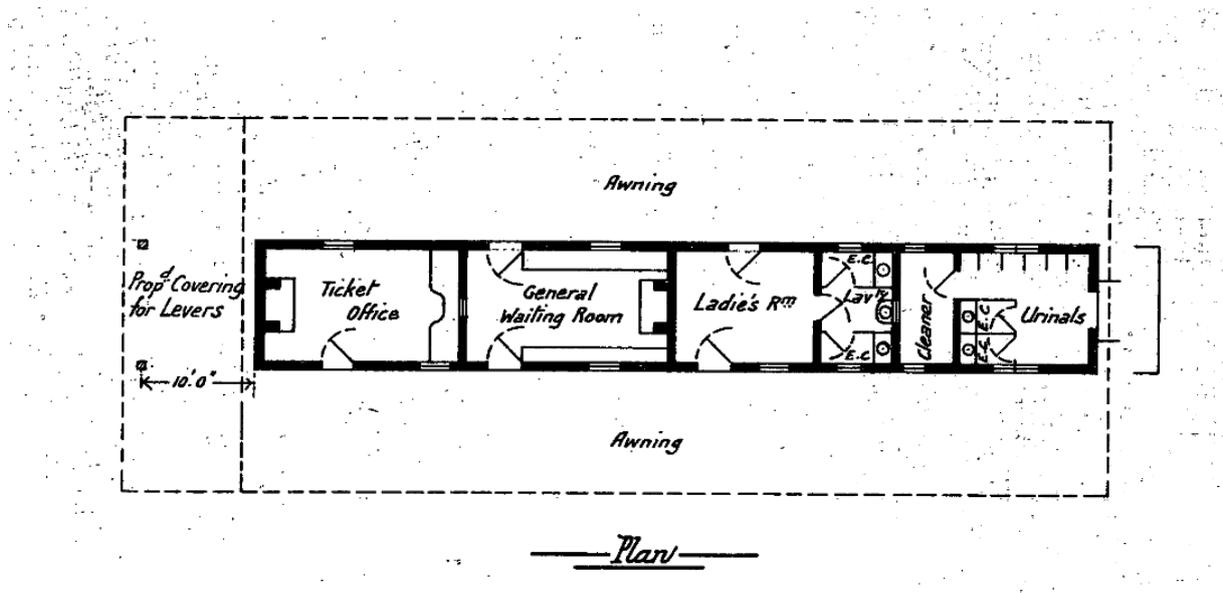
Plan of Killara Station building as constructed and completed in 1909 (Sydney Trains Virtual Plan Room)
